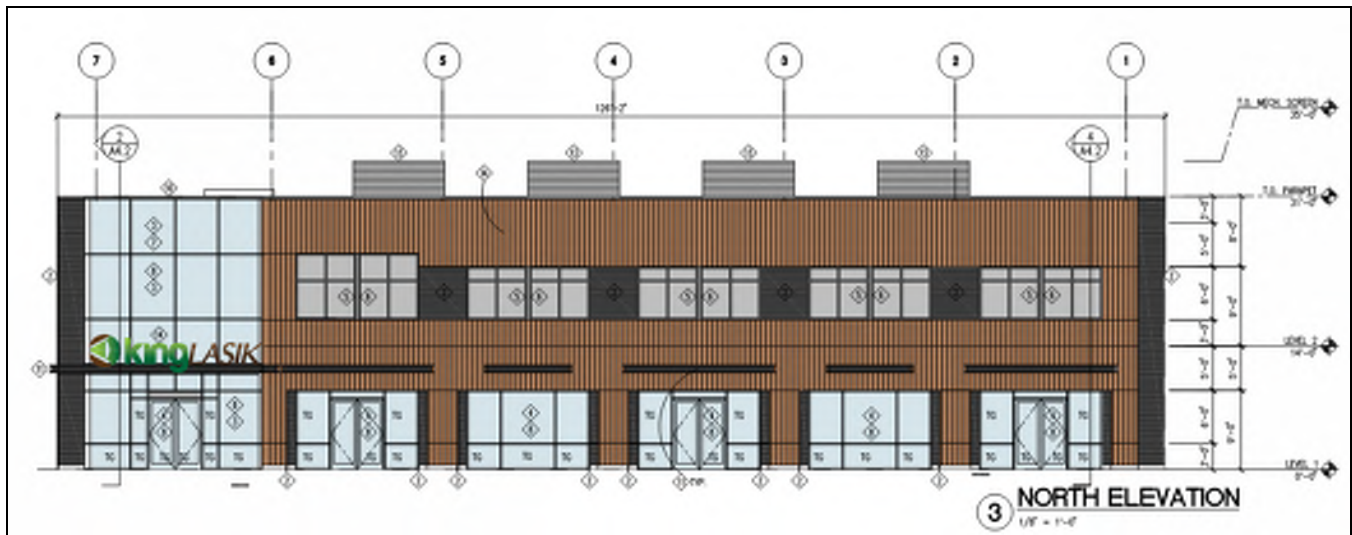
North Elevation showing windowed atrium at southeast corner of structure.
